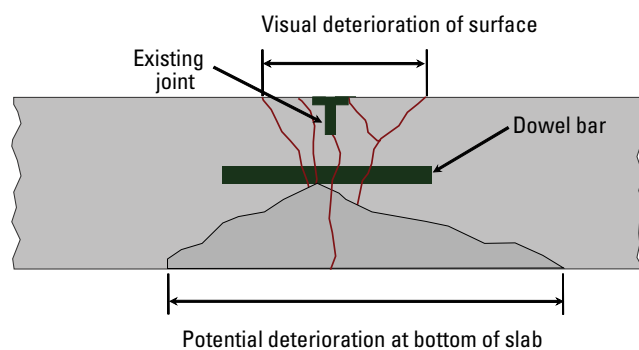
Illustration of potential extent of deterioration beneath a joint
